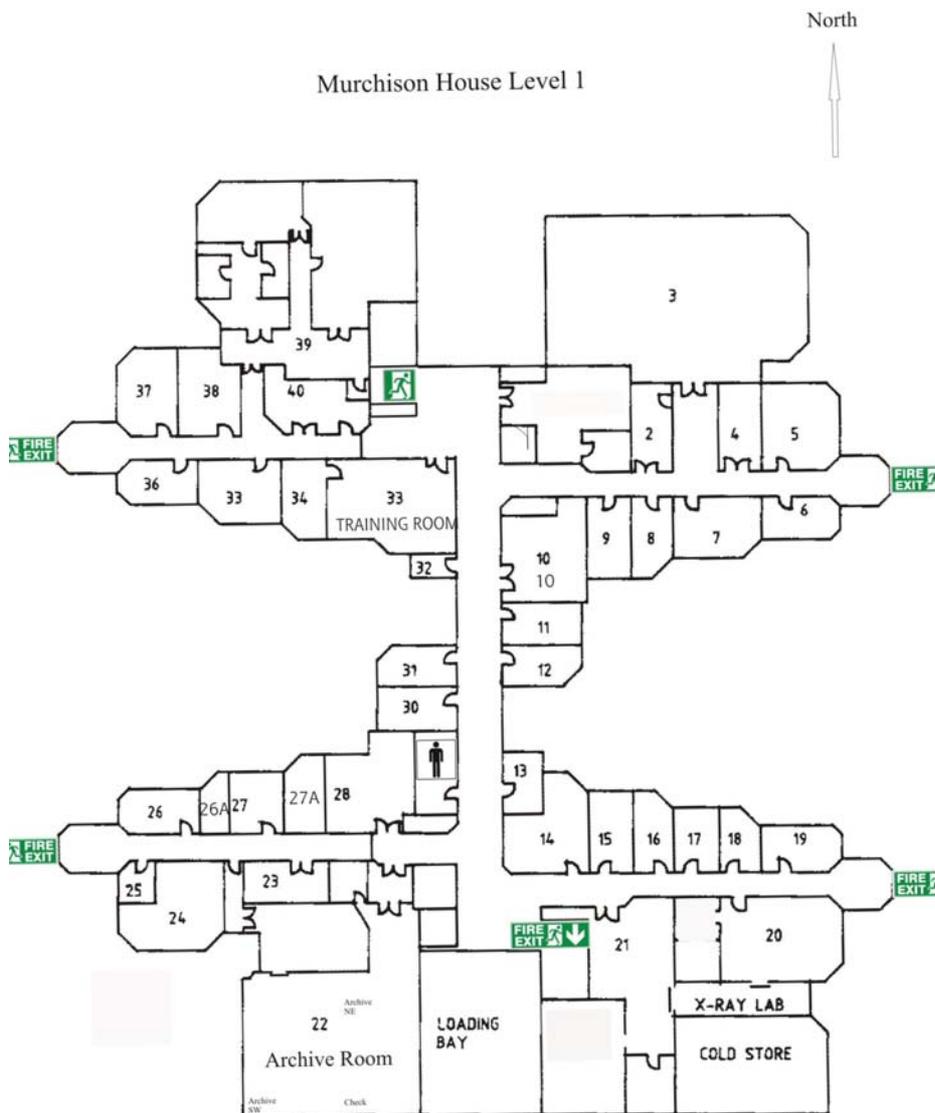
Location of Murchison House loggers: Level 1, Archive Room
